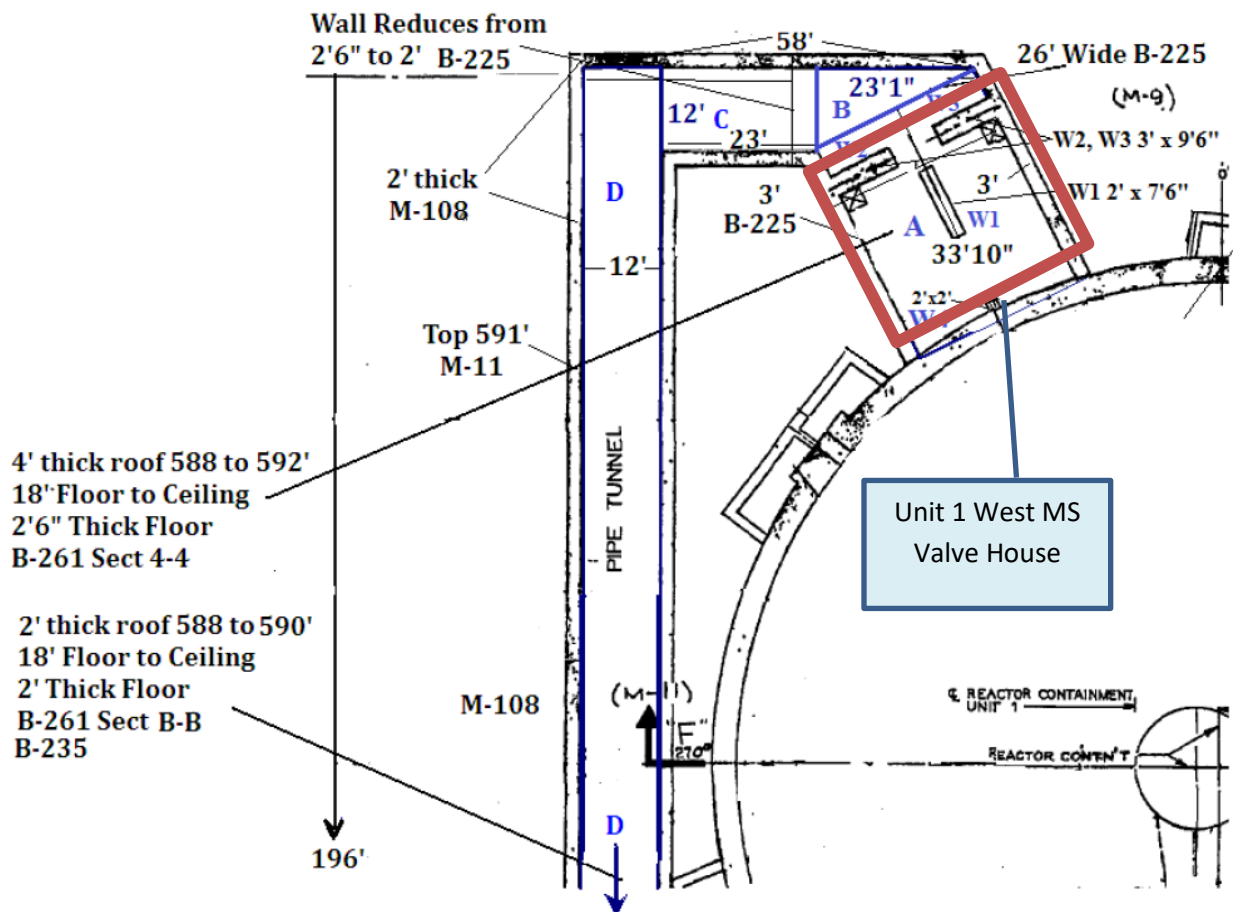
Unit 1 West Steam Tunnel Valve House Detail
